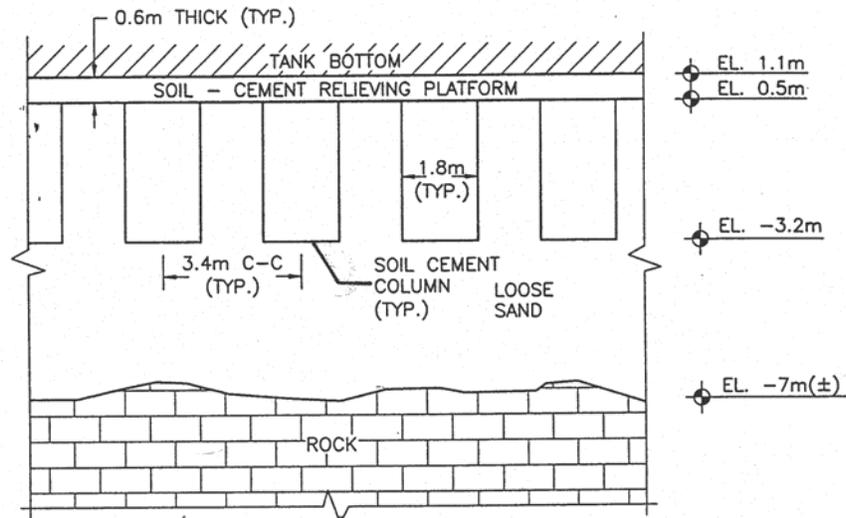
Cross Section of Soil Cement Columns at Honolulu, Hawaii
